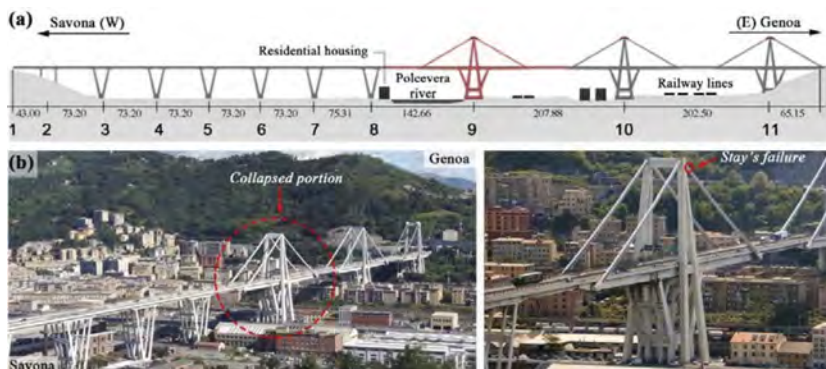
(a) Longitudinal schematic of the viaduct, (b) pre-collapse photos of the bridge and of pier 9.
